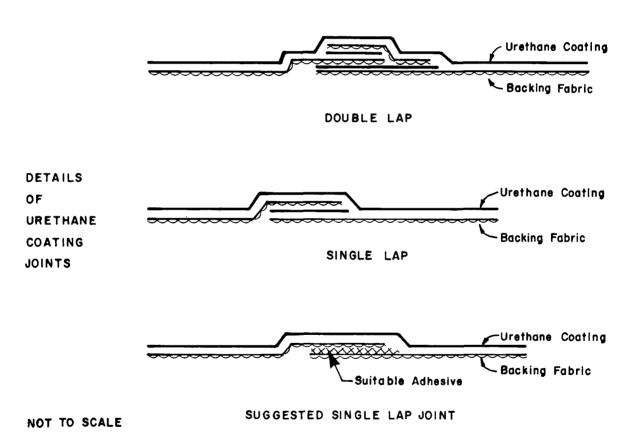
URETHANE COATINGS-JOINT AND SEAL DETAILS
